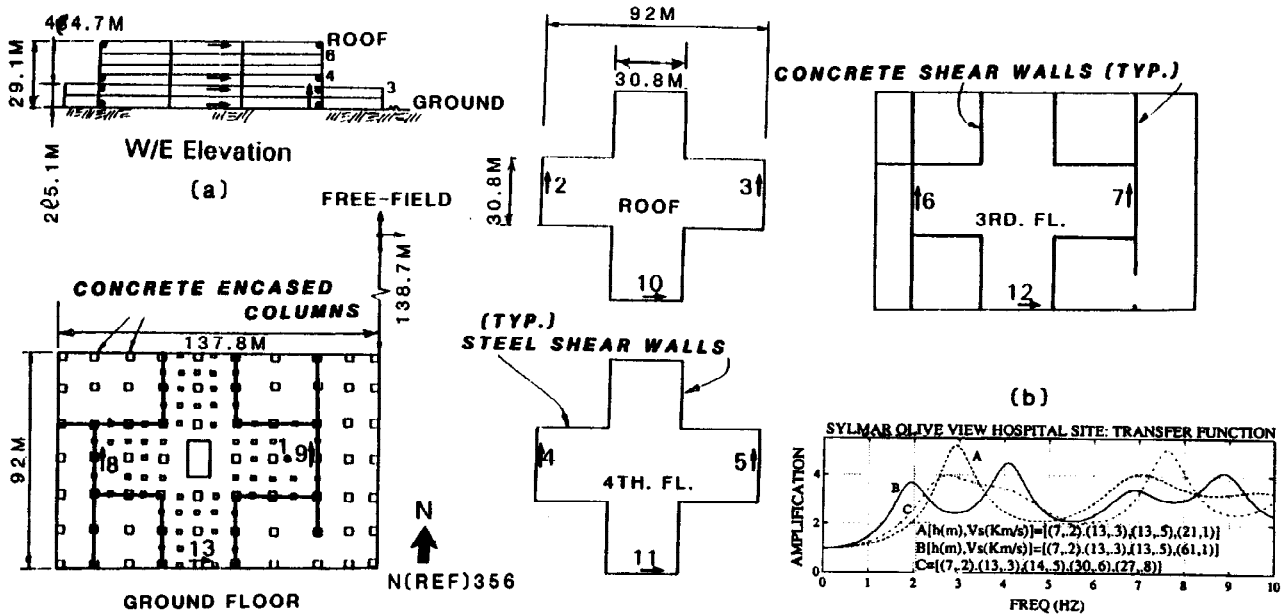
(a) Vertical section, plan and seismic sensor layout of the OVMC Building, Sylmar, California, and (b) site transfer functions of OVMC building site.
